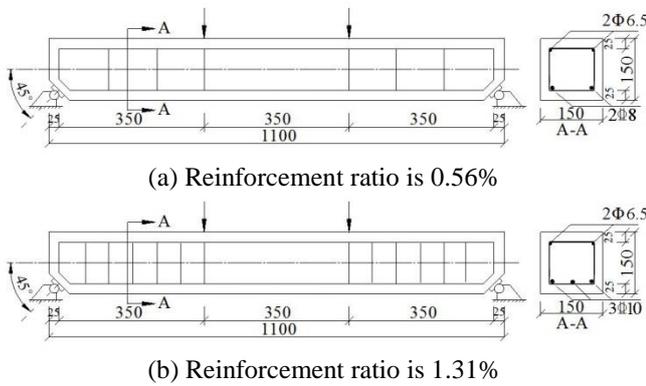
Geometry and reinforcement arrangement of test beams (Unit mm)
